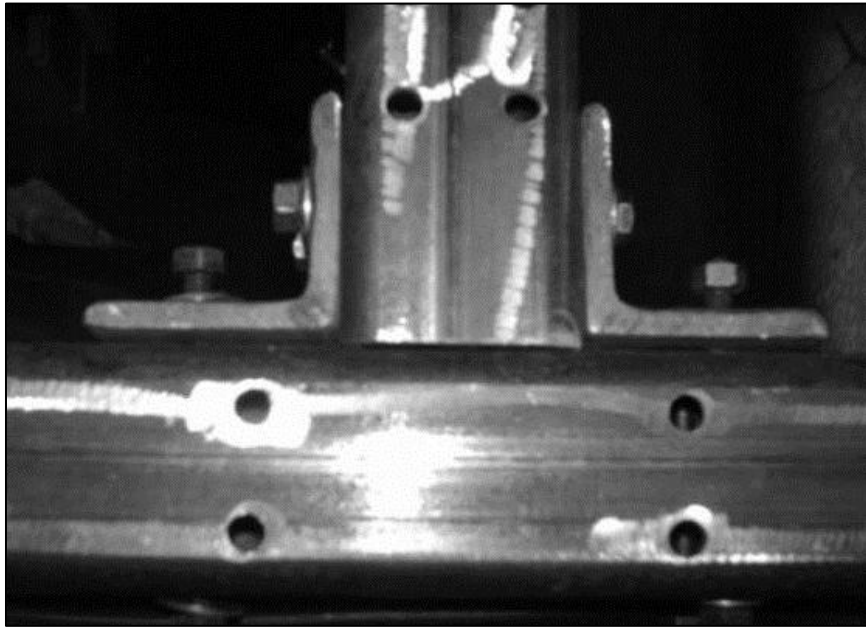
Connection Type III: Gusset Plates Removed and Remaining Bolts Loosened
